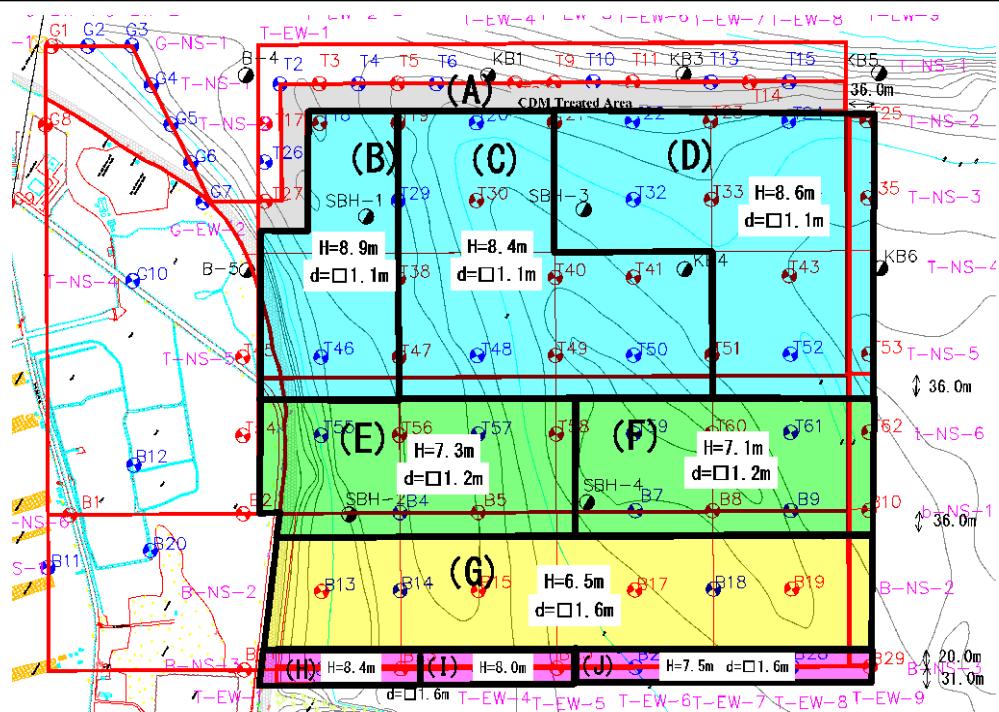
Construction Area Demarcation by PVD spacing and preload height
